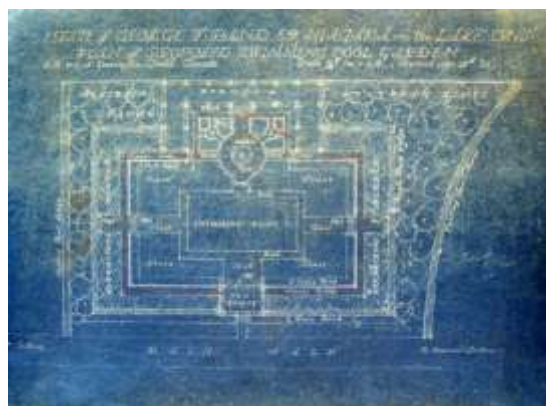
Blueprint of Dunington-Grubb Plan for Tea House and Pool, Centre for Canadian Landscape Architecture Archives, Dunington-Grubb & Stensson Fonds, 1911-1970
